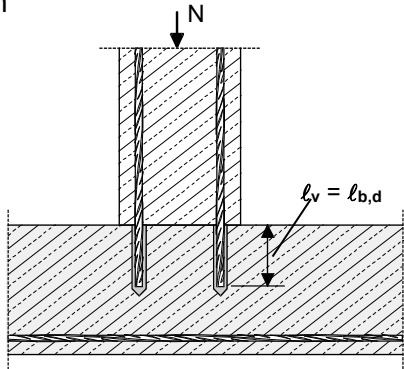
Rebar connection for components stressed primarily in compression. The rebars are stressed in compression
